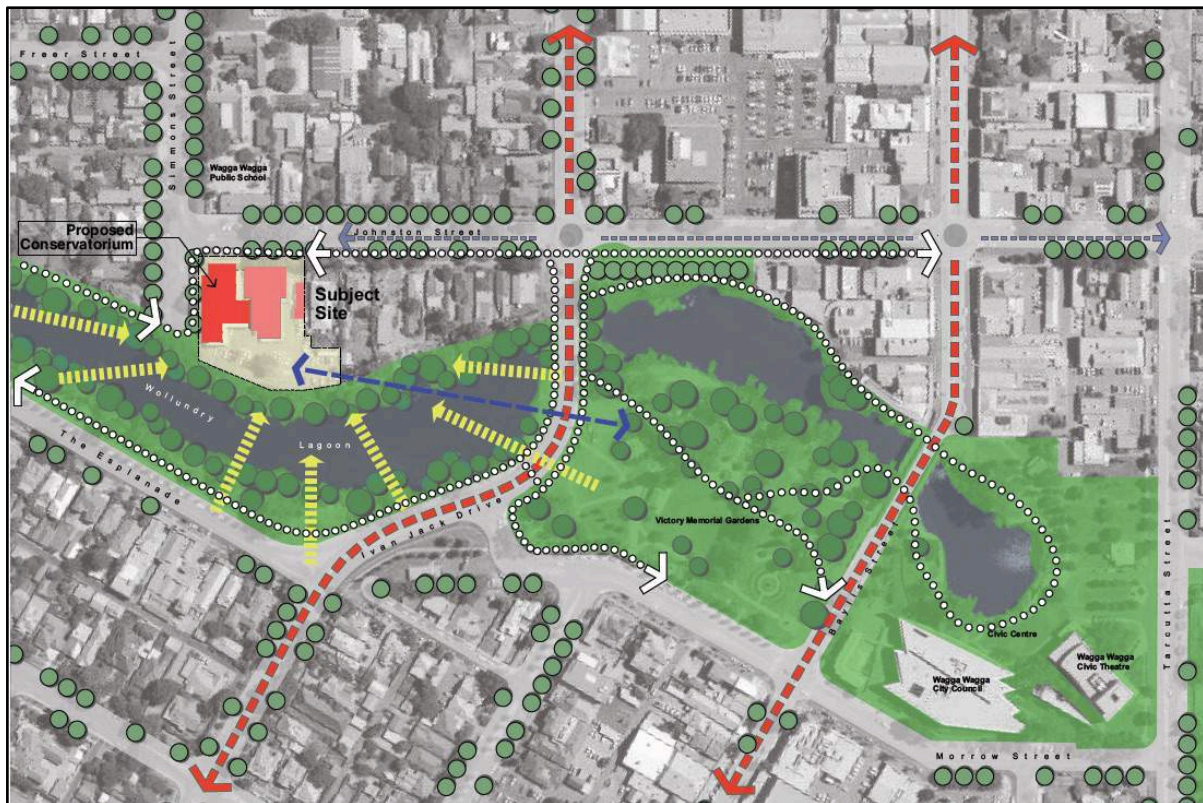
Extract from Precinct Plan (Source: Stanton Dahl Architects 2020)
